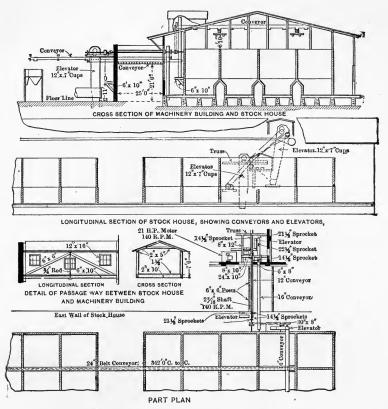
Plan and sections of stock-house, Hudson Portland Cement Co., showing conveying machinery. (Engineering News.)
